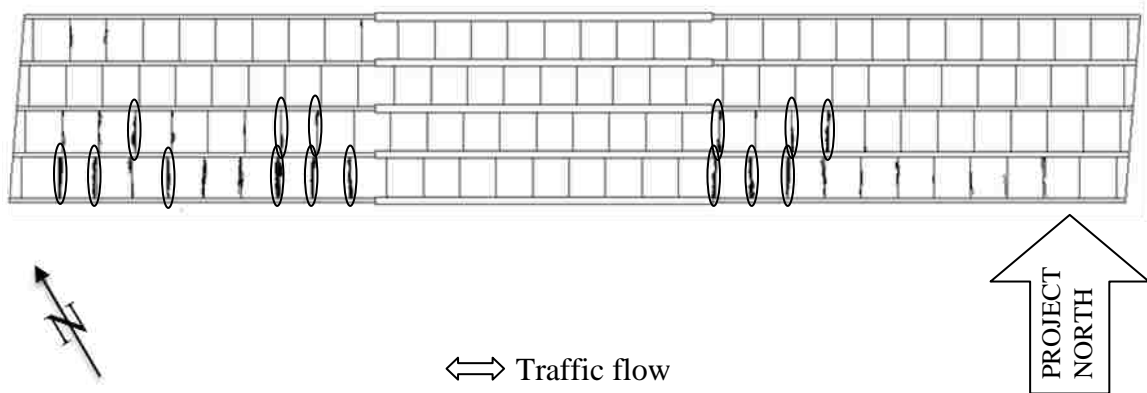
Panel spalling locations on Bridge A4709 in Mexico, MO
